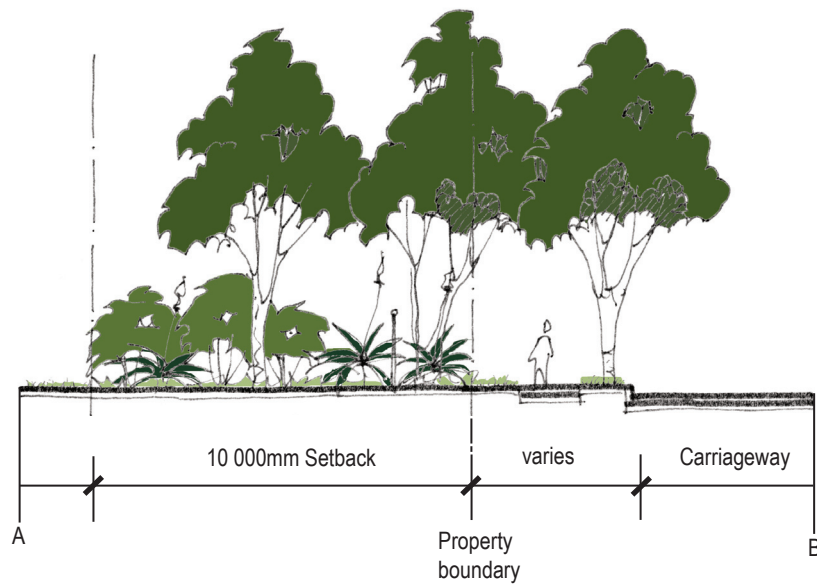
SECTION 13: Typical 10 metre landscape front setback
